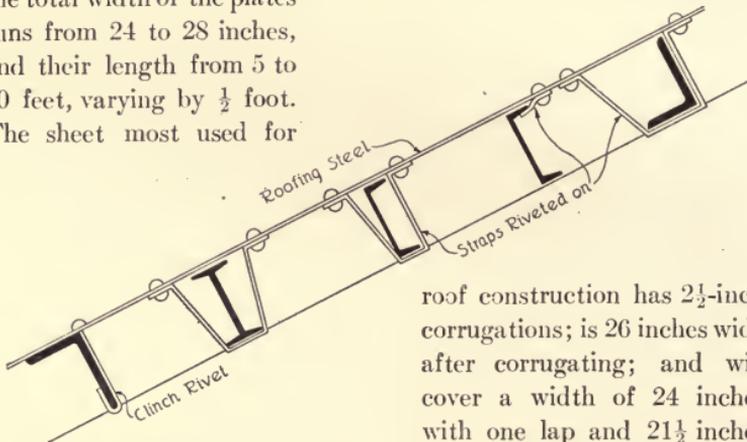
Showing How Steel Roofing is Fastened to Purlins.
